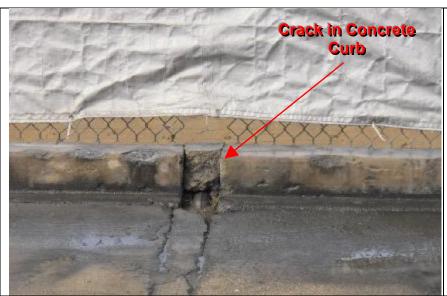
View of concrete curb from bridge over the drainage channel in the North Yard, facing north.
